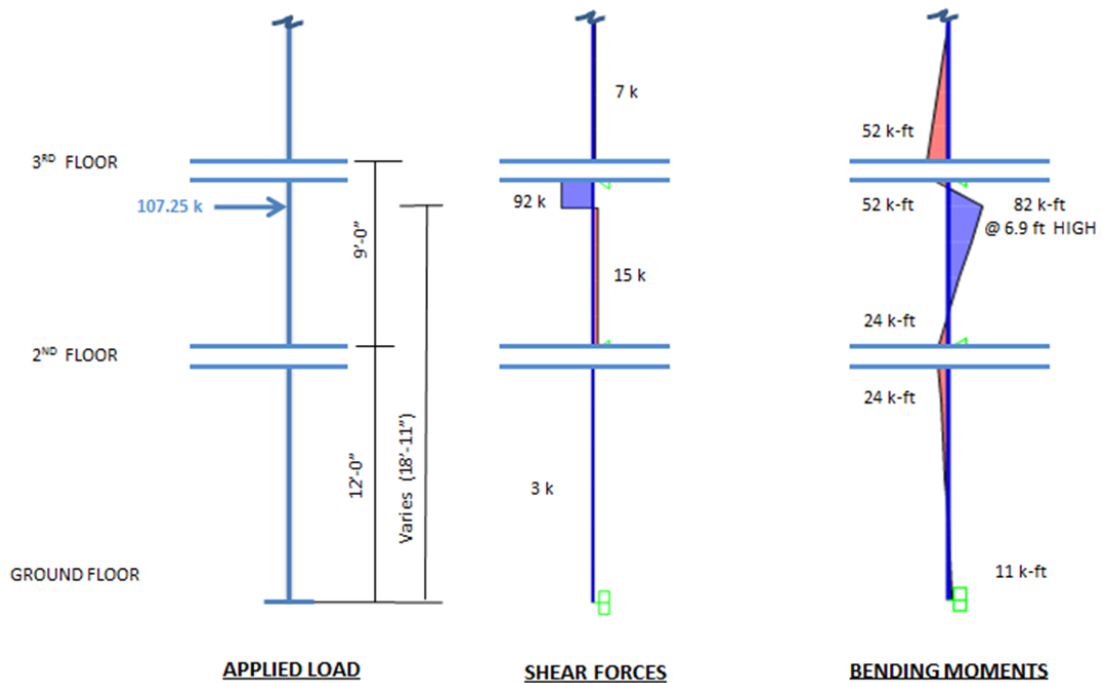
Impact load applied at "d" away from the end of column on the 2nd floor
